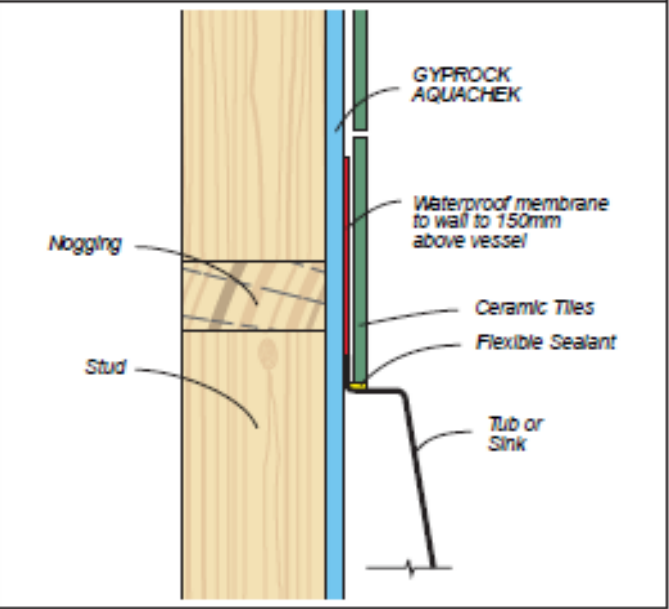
INSTALLATION LAYOUT FOR A BATH WITHOUT SHOWER
